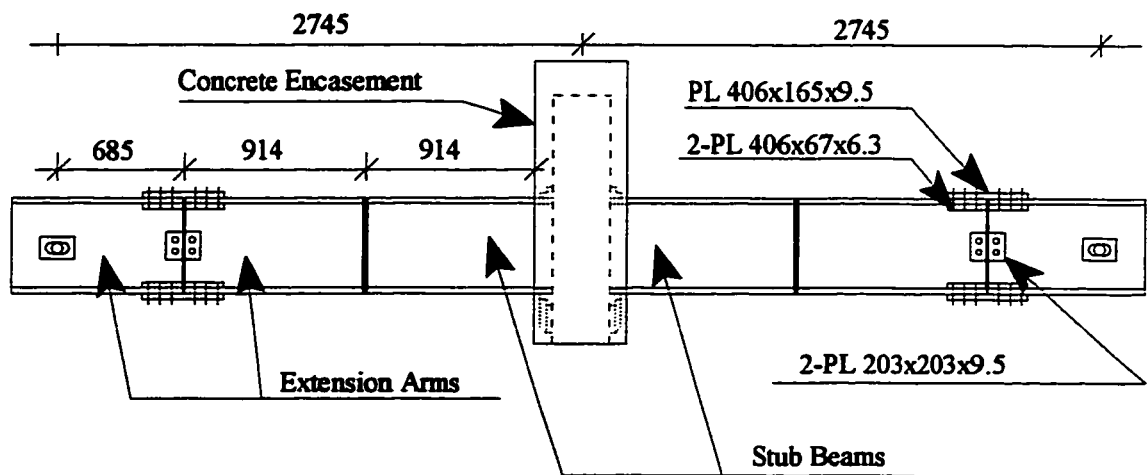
Typical specimen showing existing stub beams, additional extension arms and splice locations.
